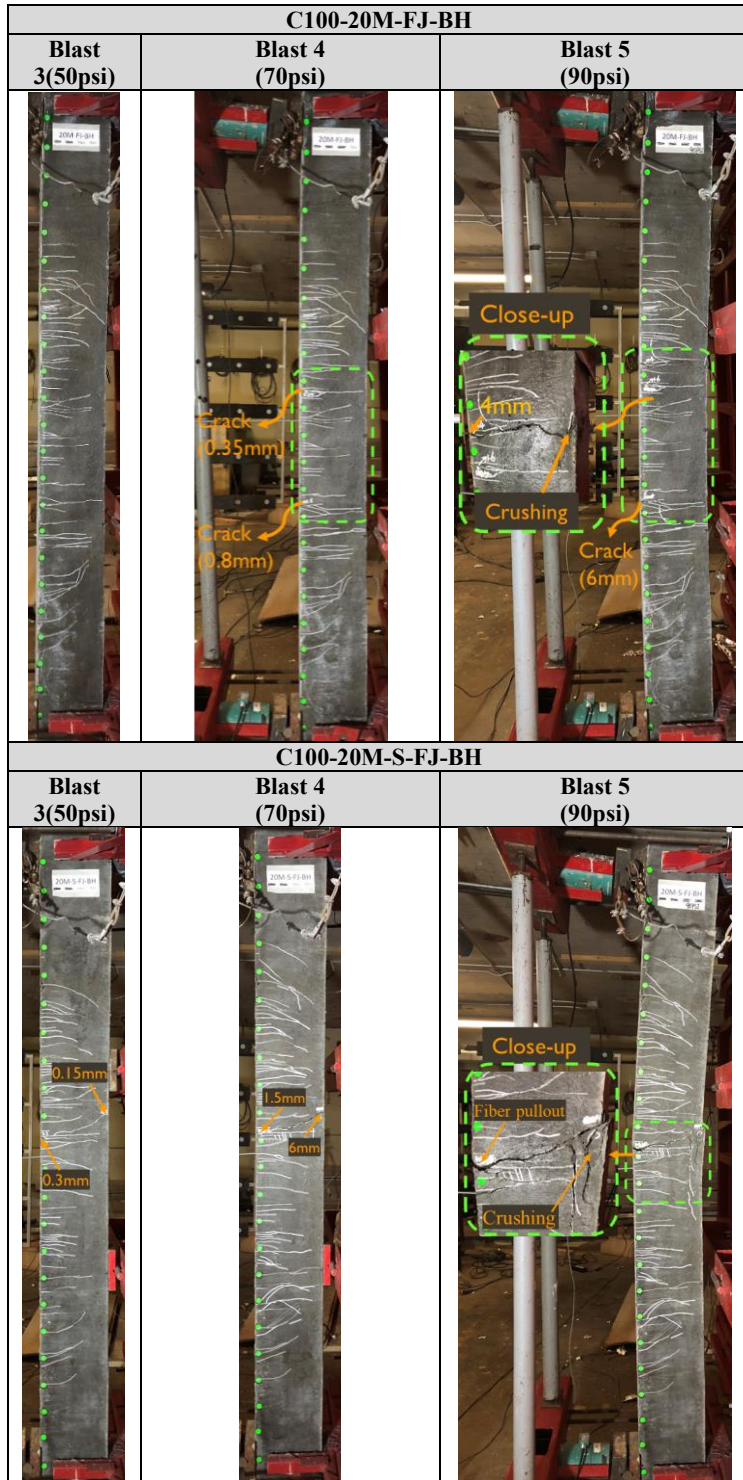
17 Damage profiles of specimens with or without stirrups
